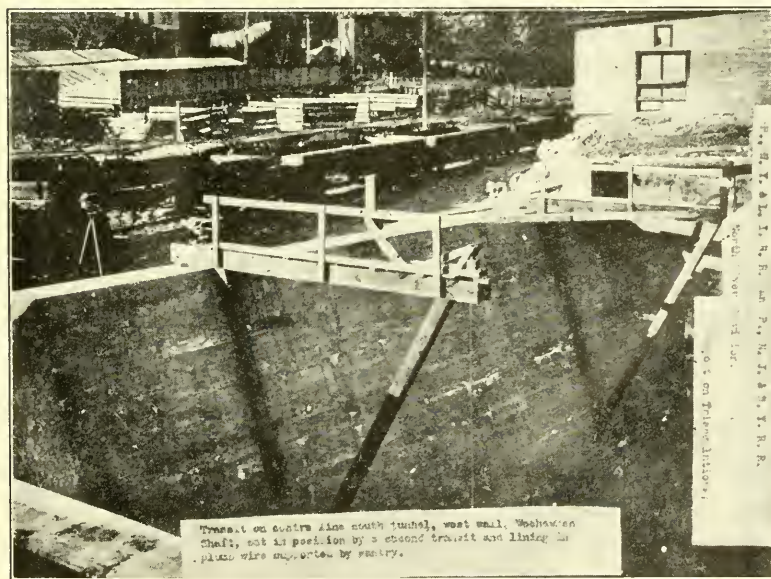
TRANSIT ON CENTER LINE, SOUTH TUNNEL, WEST WALL, WEEHAWKEN SHAFT, SET IN POSITION BY A SECOND TRANSIT, AND LINING IN PLUMB-WIRE SUPPORTED BY GANTRY.
